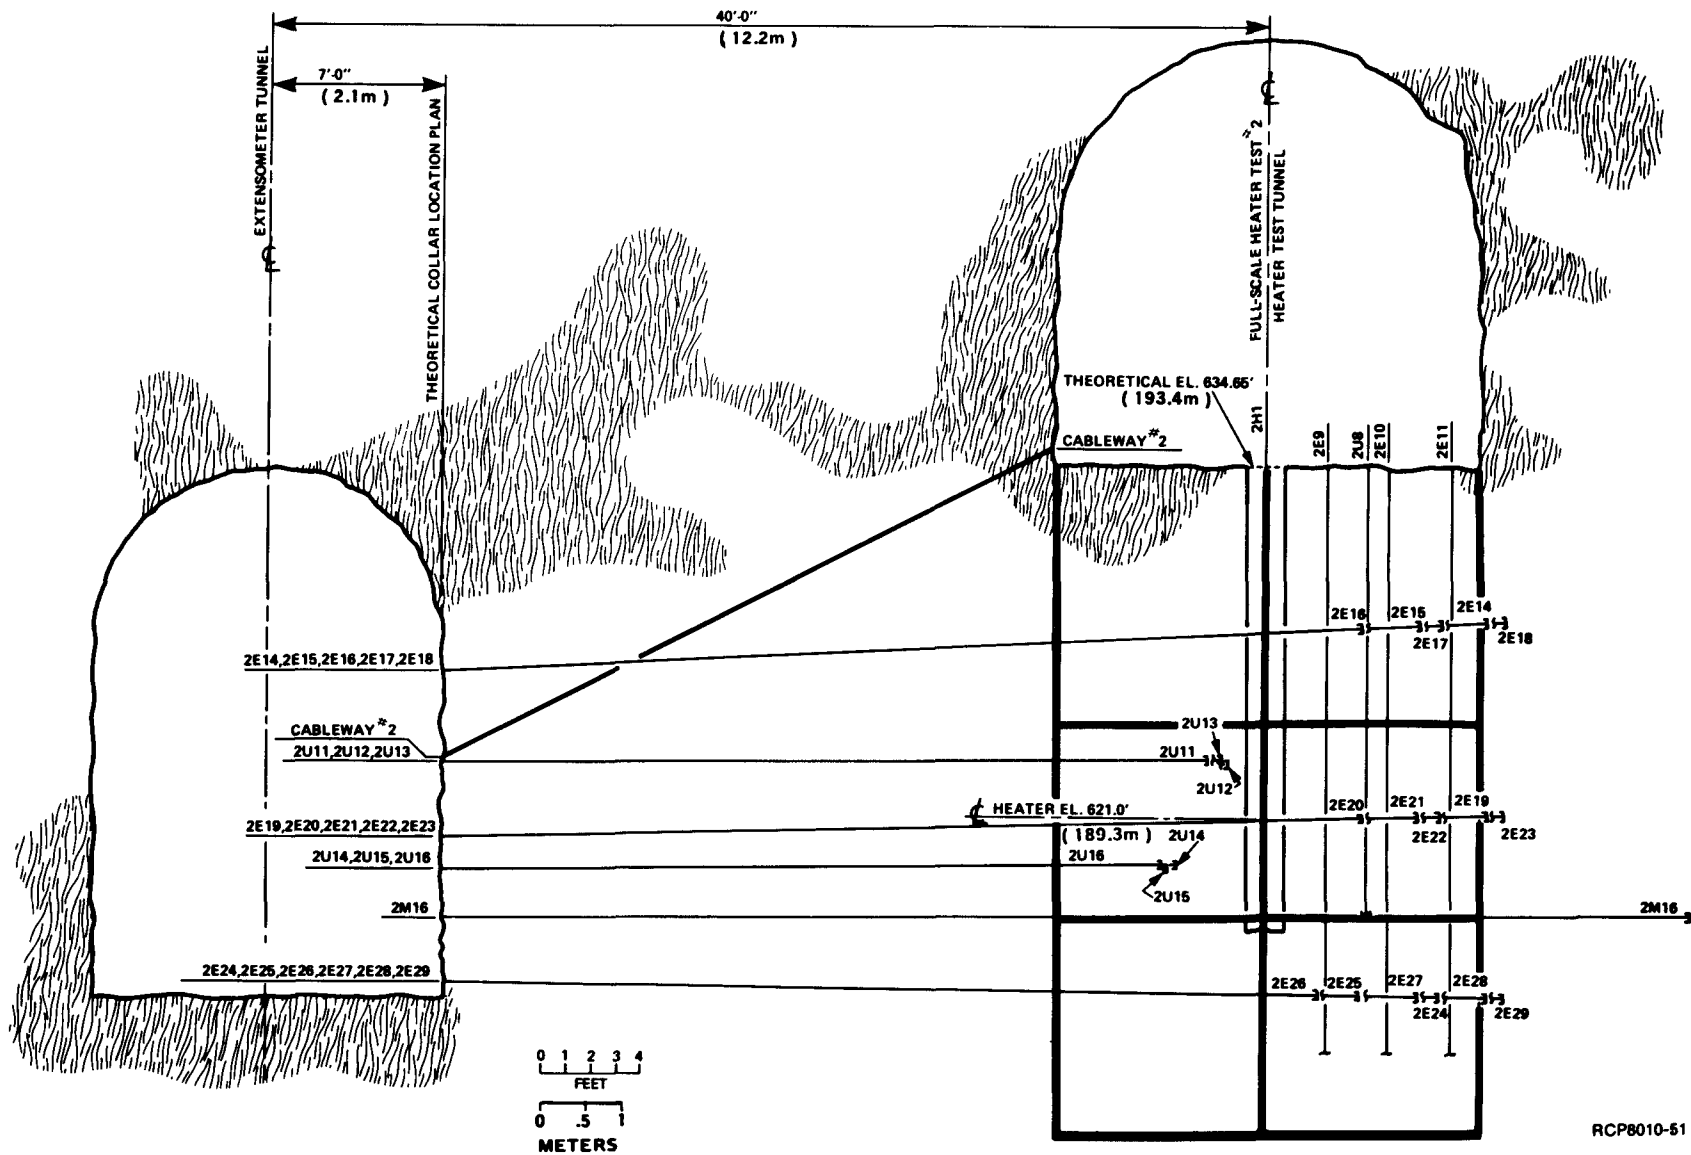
Elevation View of Boreholes for Full-Scale Heater Test #2 (looking east).
